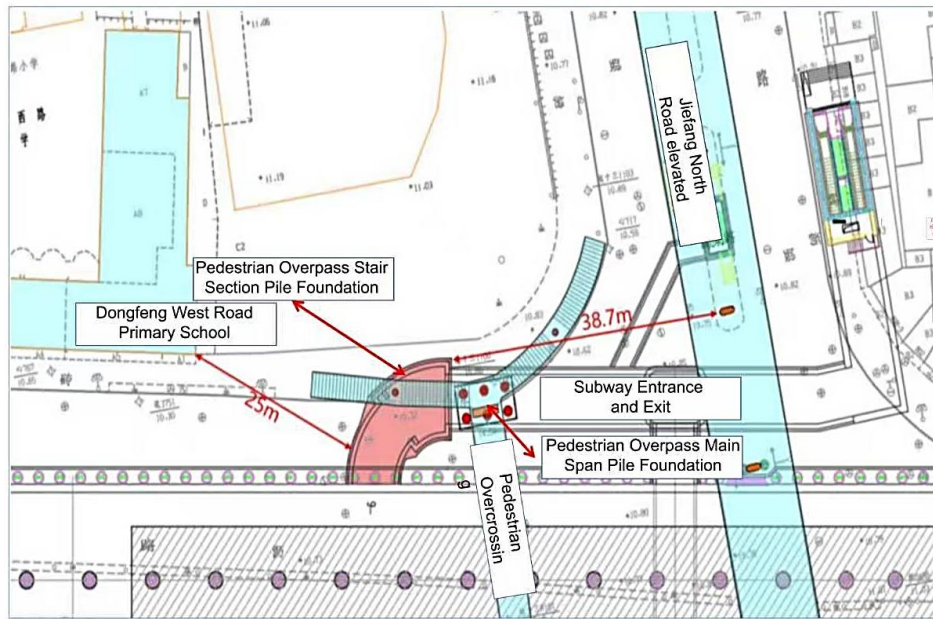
Relative position of pile foundation of subway entrances and pedestrian bridge
